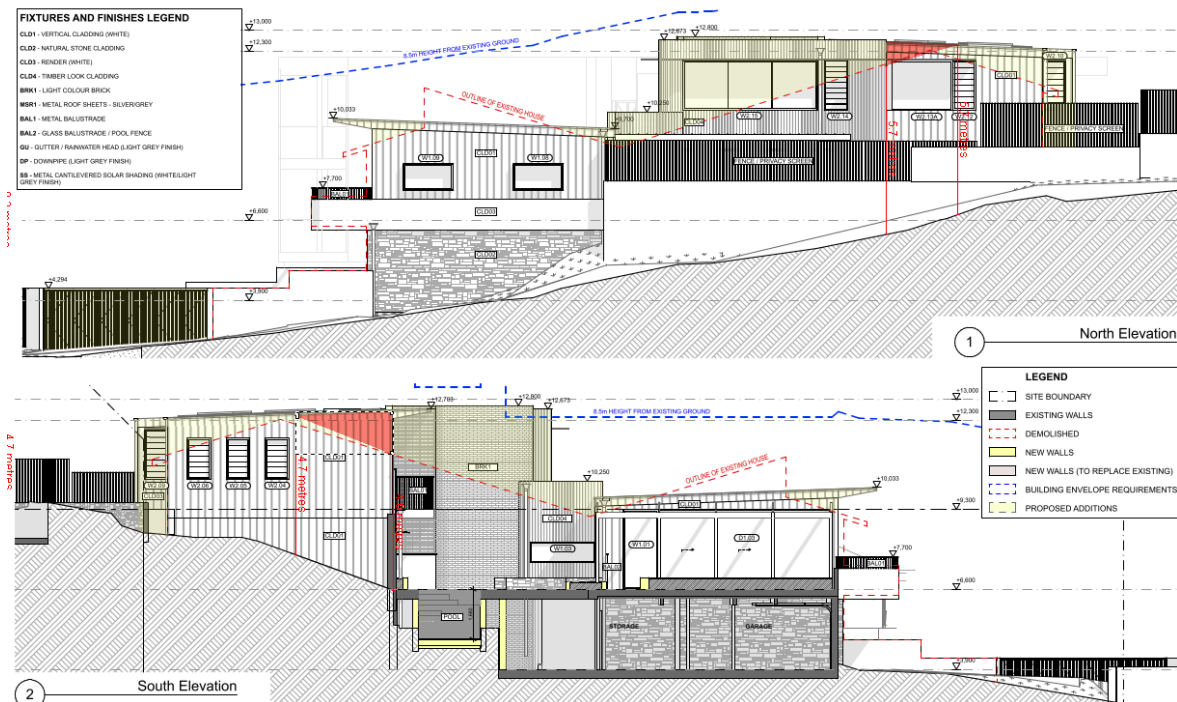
North-western elevation and south-eastern elevation showing envelope breaches in red
